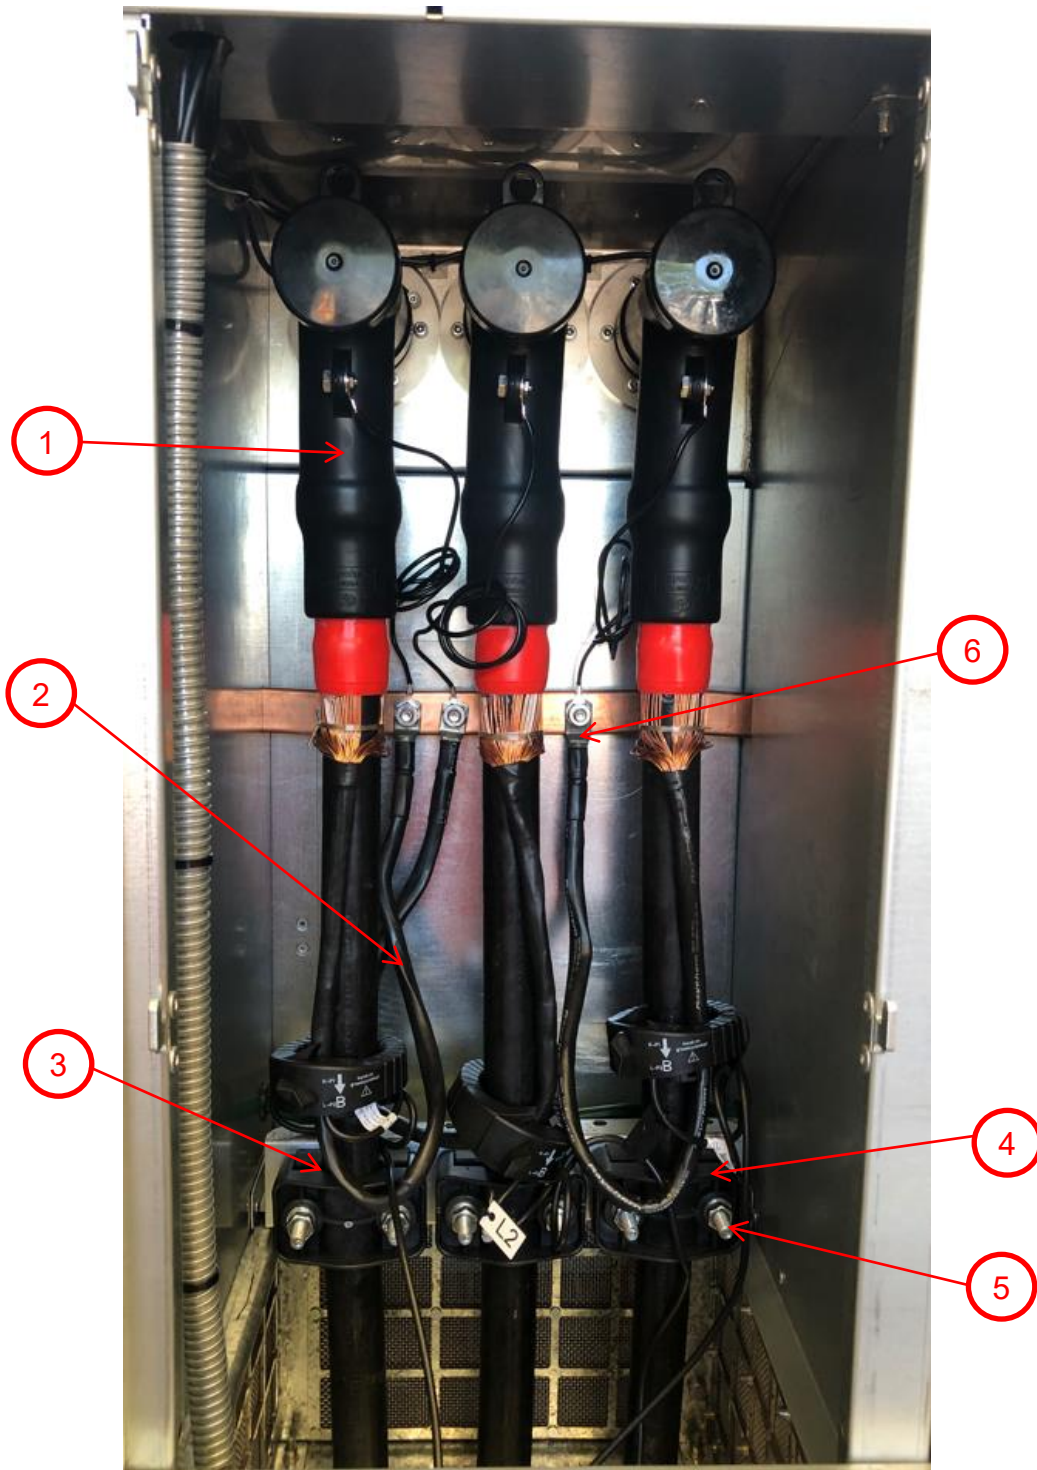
Indoor Feeder Cable Termination (Front View)
